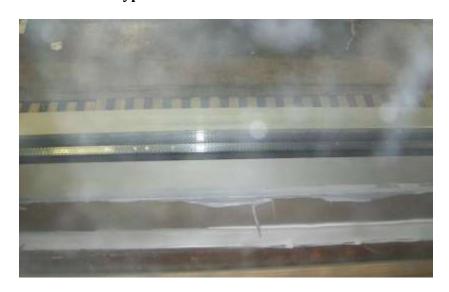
Specimens #1, #2 and #3 Typical Glazing Pocket During 15.00 psf Water Test
